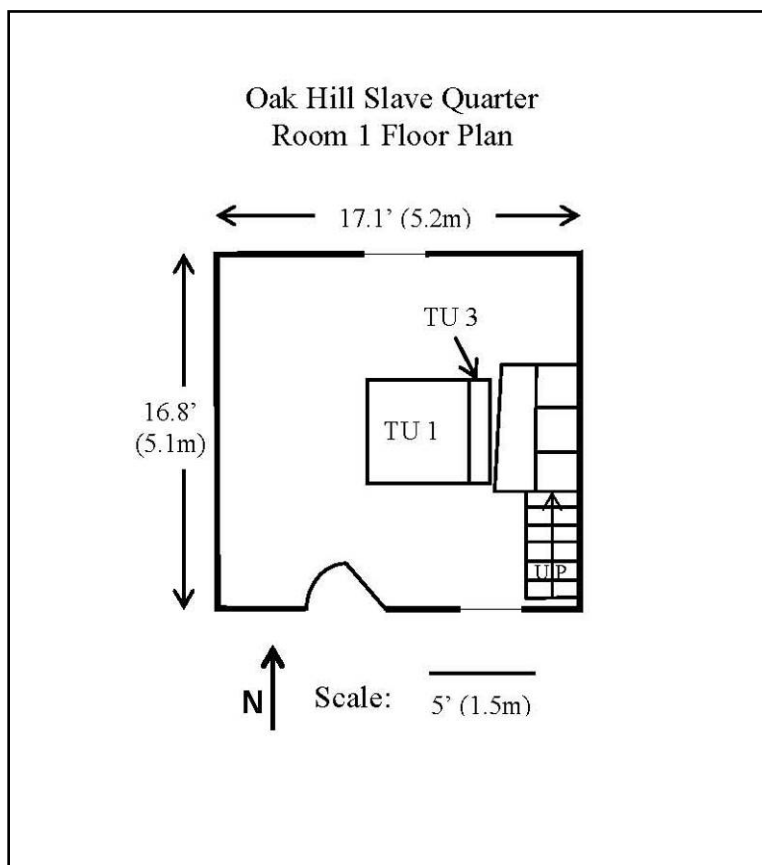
Oak Hill slave quarter Room 1 floor plan.
